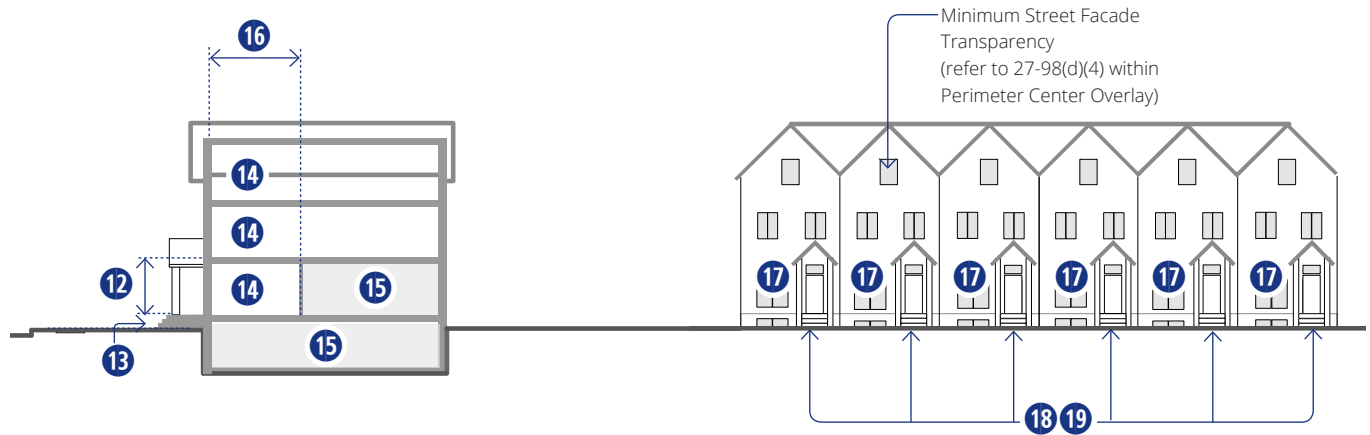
Townhouse Building: Floor-to-Floor Height & Use Requirements
